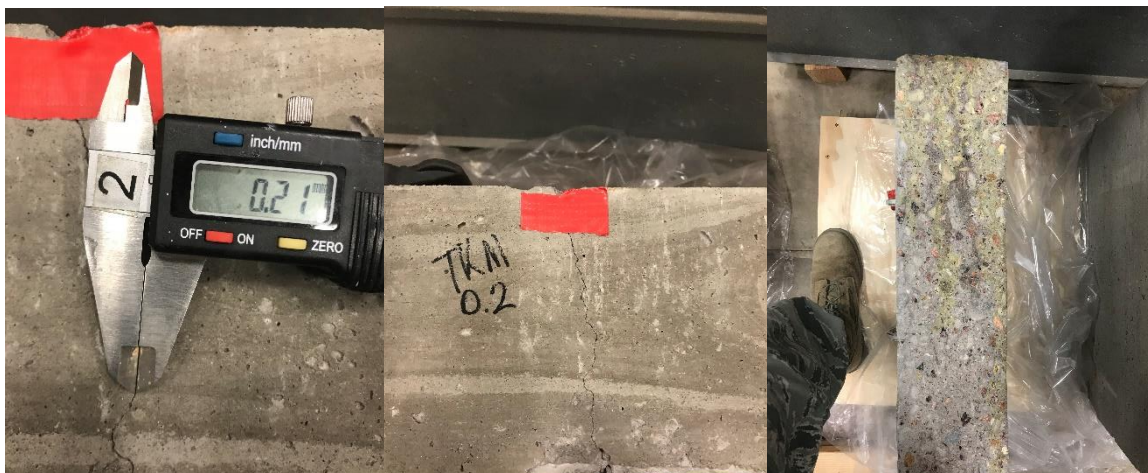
TK-2415 Slab Specimen at 0.2 mm
